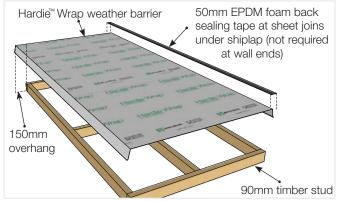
HARDIE[™] WRAP INSTALLATION
